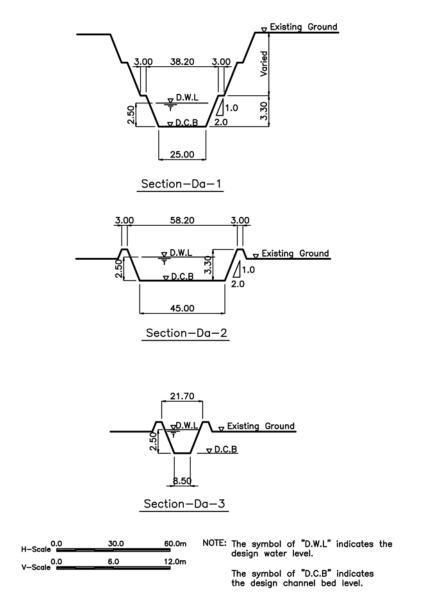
Proposed Typical Cross Sections of the Dasht-e-Sheikh River
